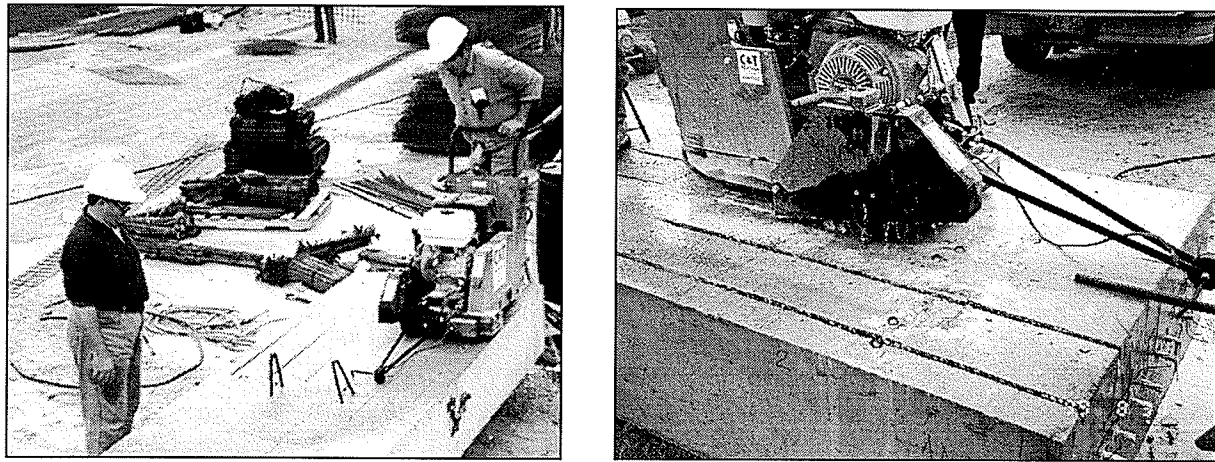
Cutting grooves for near surface mounted CFRP bars
